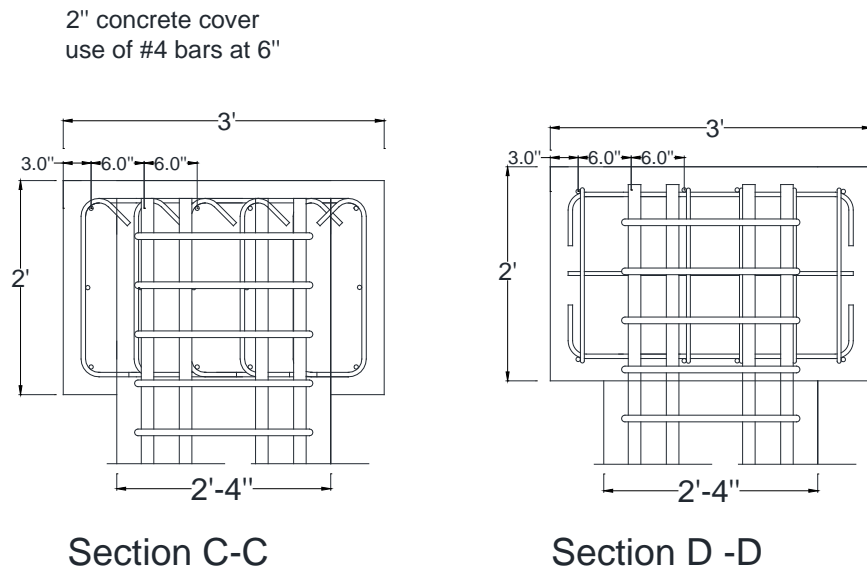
Elevation view of cap details (see Figure 2.5 for section locations)
